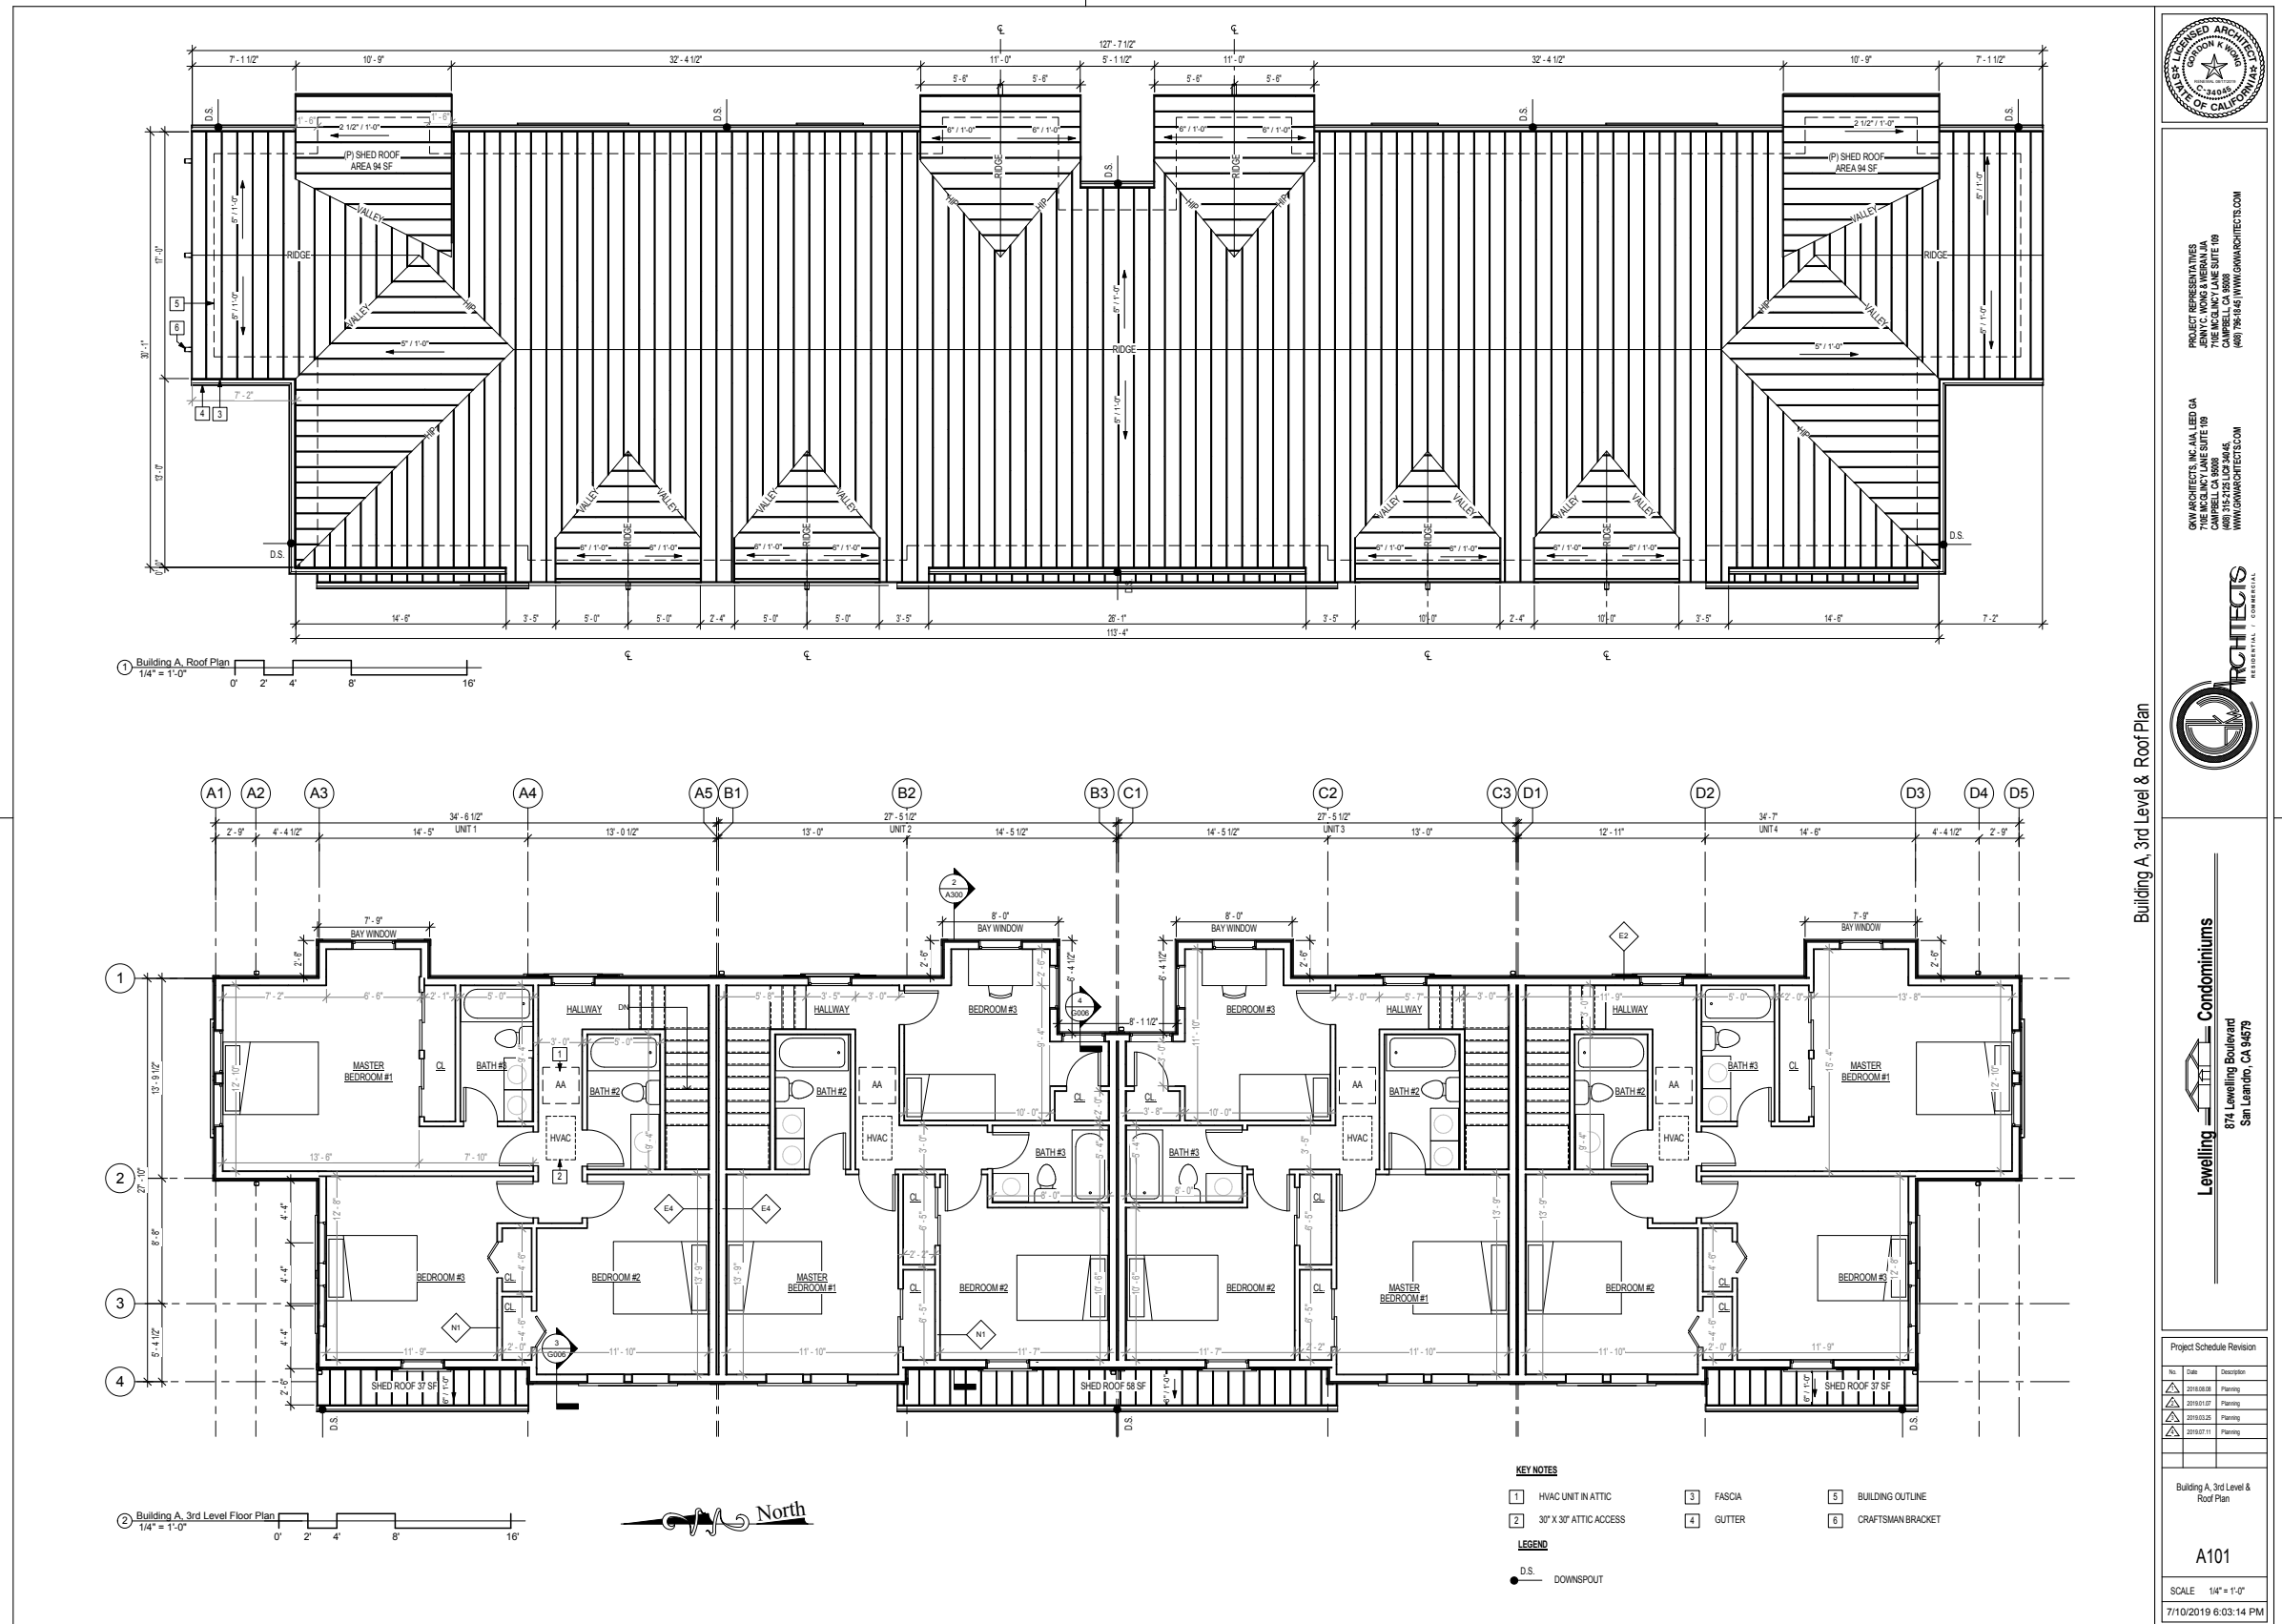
BUILDING A FLOOR 3 AND ROOF
